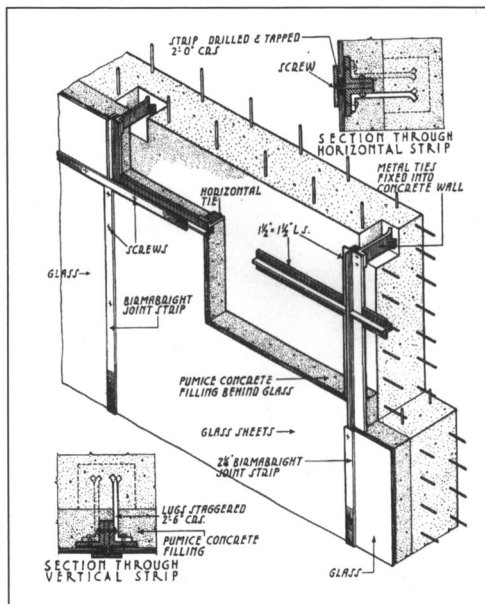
Fixing glass to a concrete backing with Birmabright coverstrips, the kind of detail used for the Daily Express Building (from *Building*, 1935).
